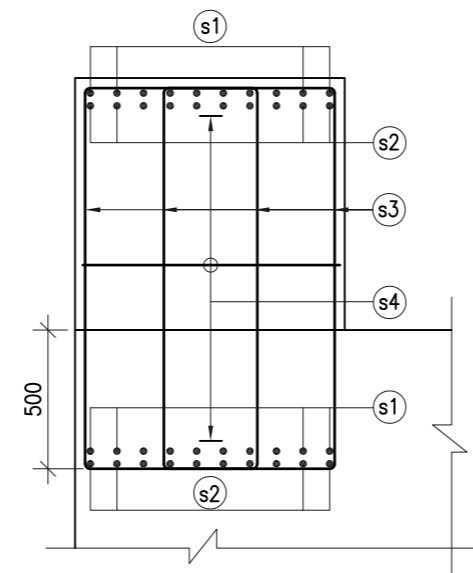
Ø MESH REIN. (UNDER JACK LOCATION 20mm BELOW PIER CAP) (SCALE 1:25)
